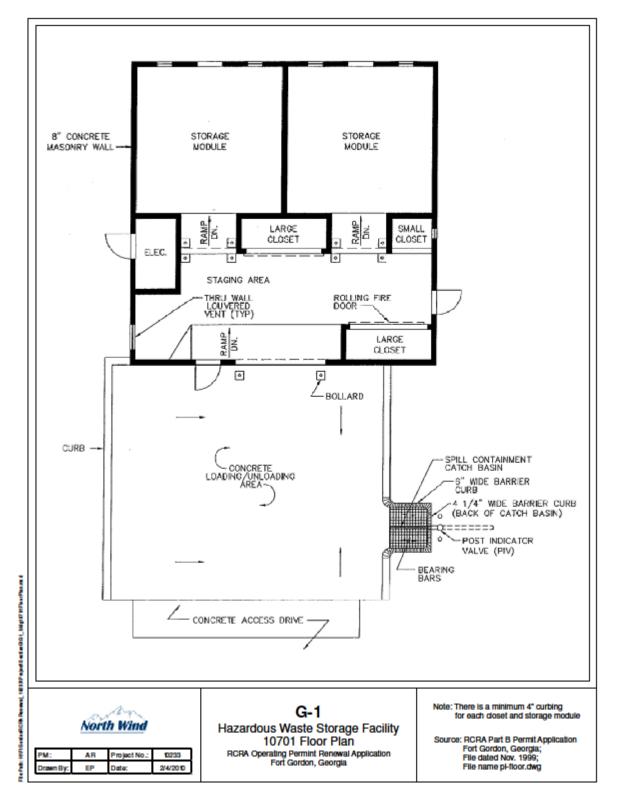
Hazardous Waste Storage Facility 10701 Floor Plan
